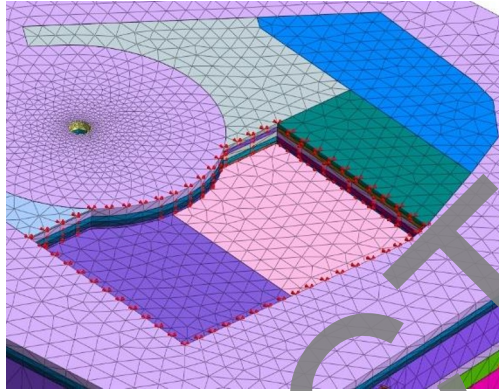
Modeling of the foundation pit fastening by prohibiting horizontal movement of soil in a 3D model (sections of the foundation № 3, 2-I)
